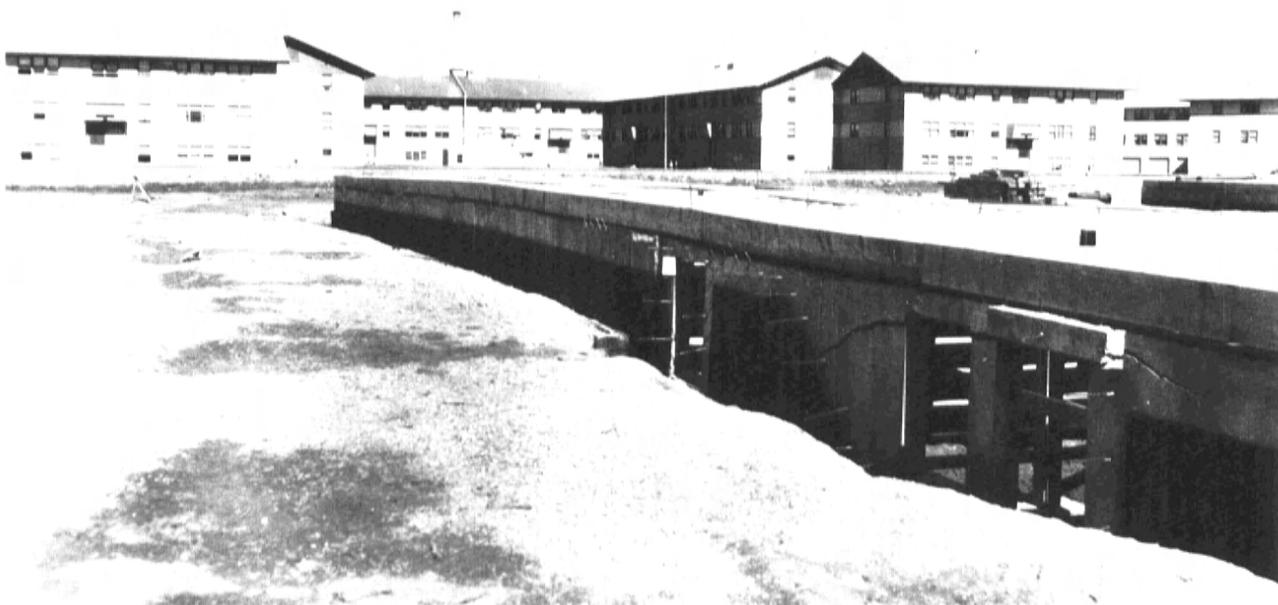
Fracturing of 6-inch-thick, steel-reinforced, concrete foundation on Airport Road in Fairbanks by frost heaving during winter of 1953-54. Concrete walls and uprights heaved from 6 to 12 inches. Photograph 930 by T.L. Péwe, May 8, 1954.
